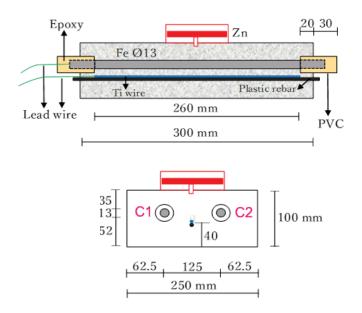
Detailed layout of concrete specimens with Zn Cartridge and Ti wire sensor embedded in concrete
